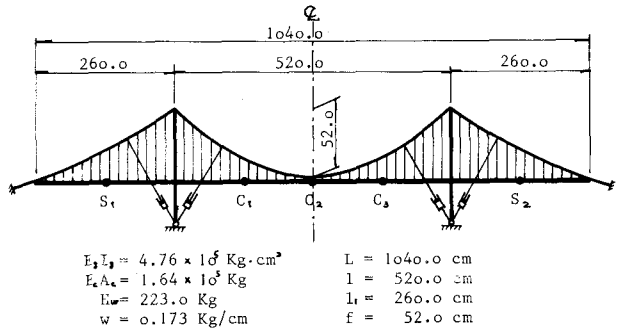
Suspension Bridge Model with Cable Stay Dampers and Measuring Bents.
